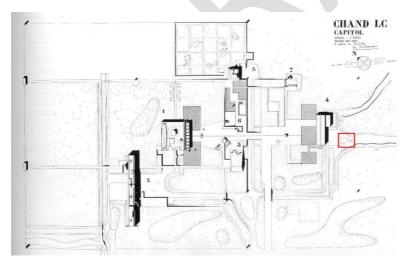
Original site layout of Capitol Complex highlighting Tonga Block © Fondation Le Corbusier 3.1.4 Lawyers Chamber (old)
